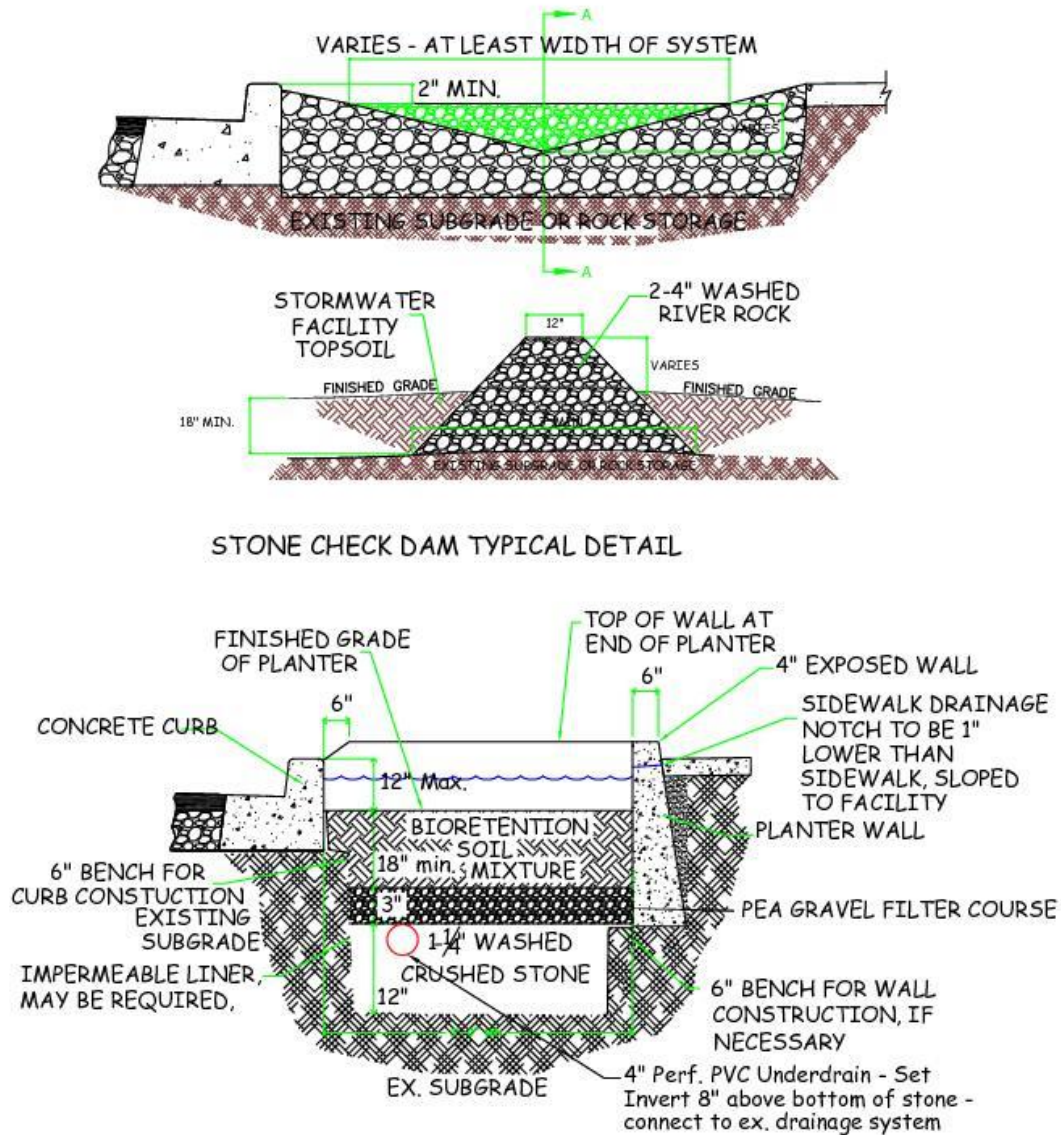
Cross Sectional view of LISD Planter systems (Trinkaus Engineering, LLC - 2017)
